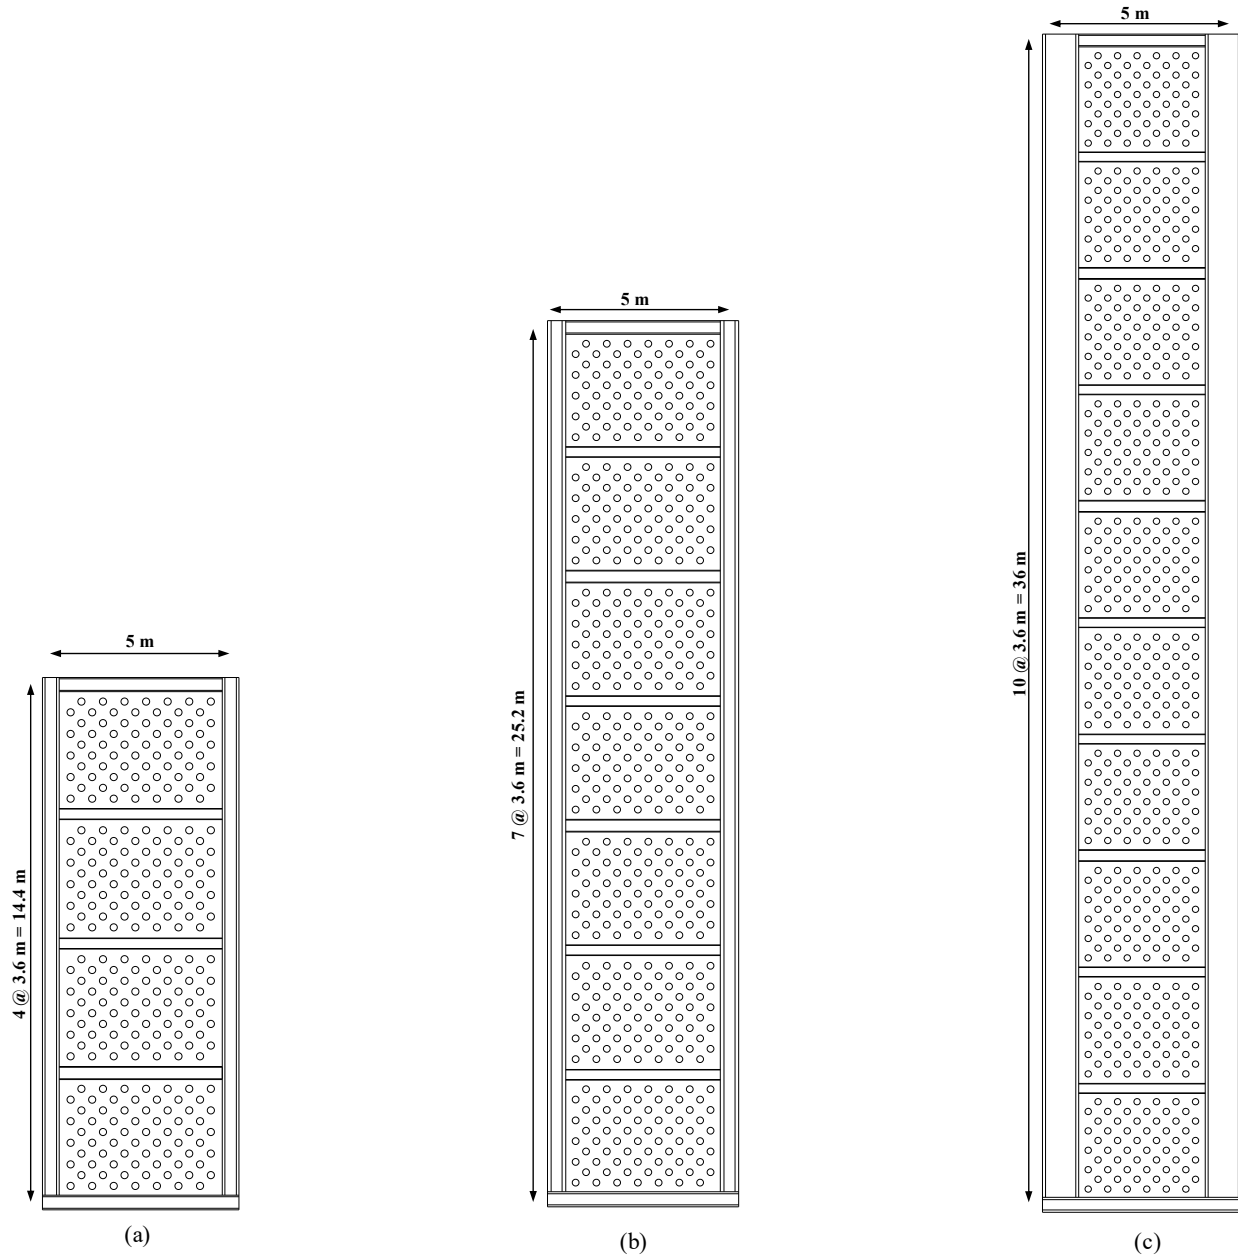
Typical elevation view of studied P-SPSWs; (a) 4-storey; (b) 7-storey; (c) 10-storey
